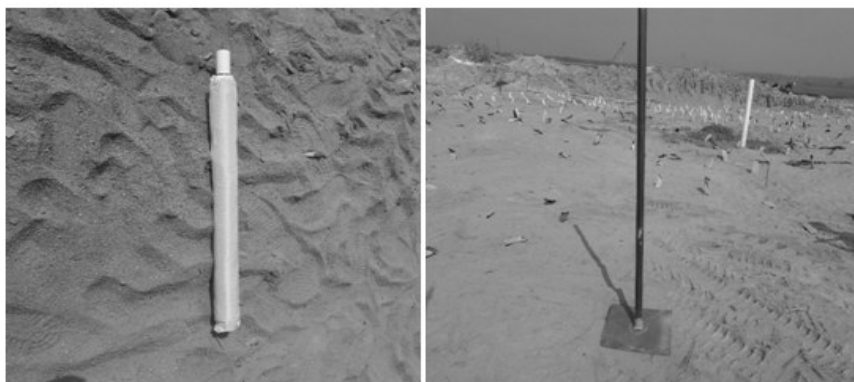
Casagrande type Piezometer & Plate type Settlement Recorder
